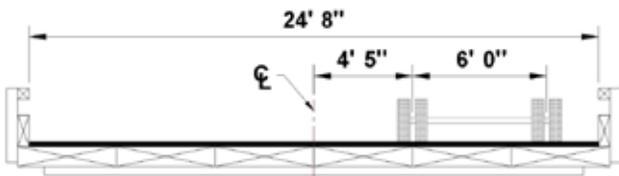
Controlling transverse load position for Bolivar Bridge.
